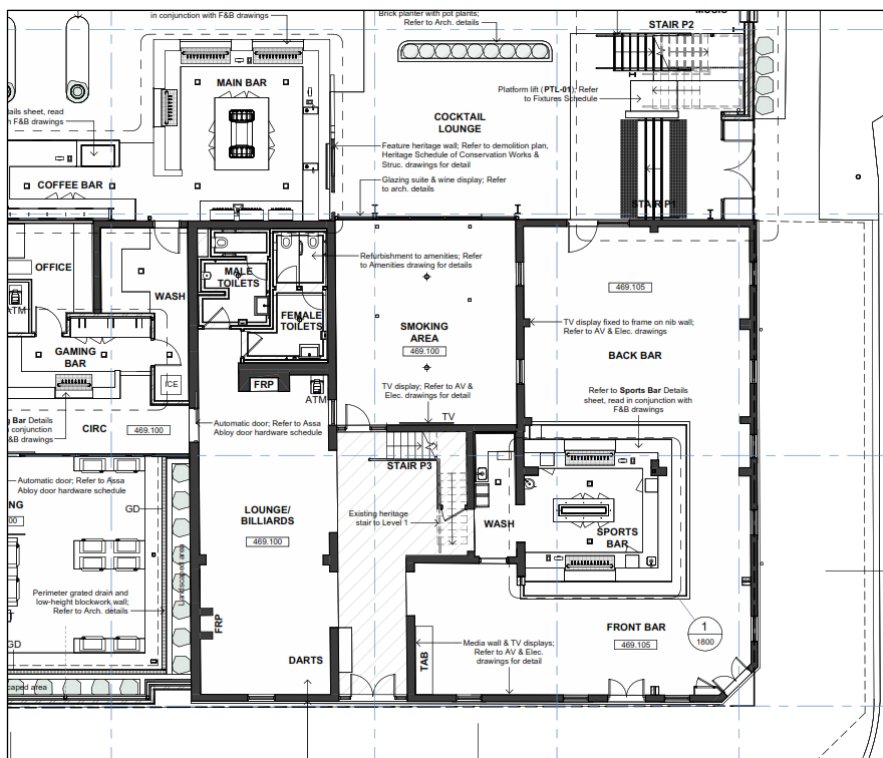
Amended Ground Floor Plan, Bergstrom Architects
